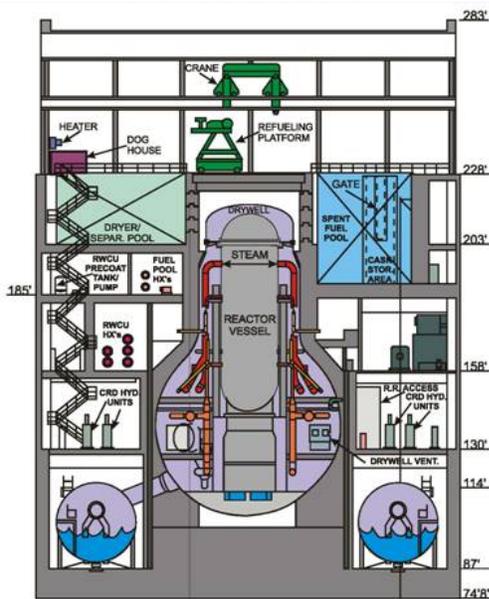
Typical BWR Mark I primary containment and reactor building (secondary containment) arrangement.
